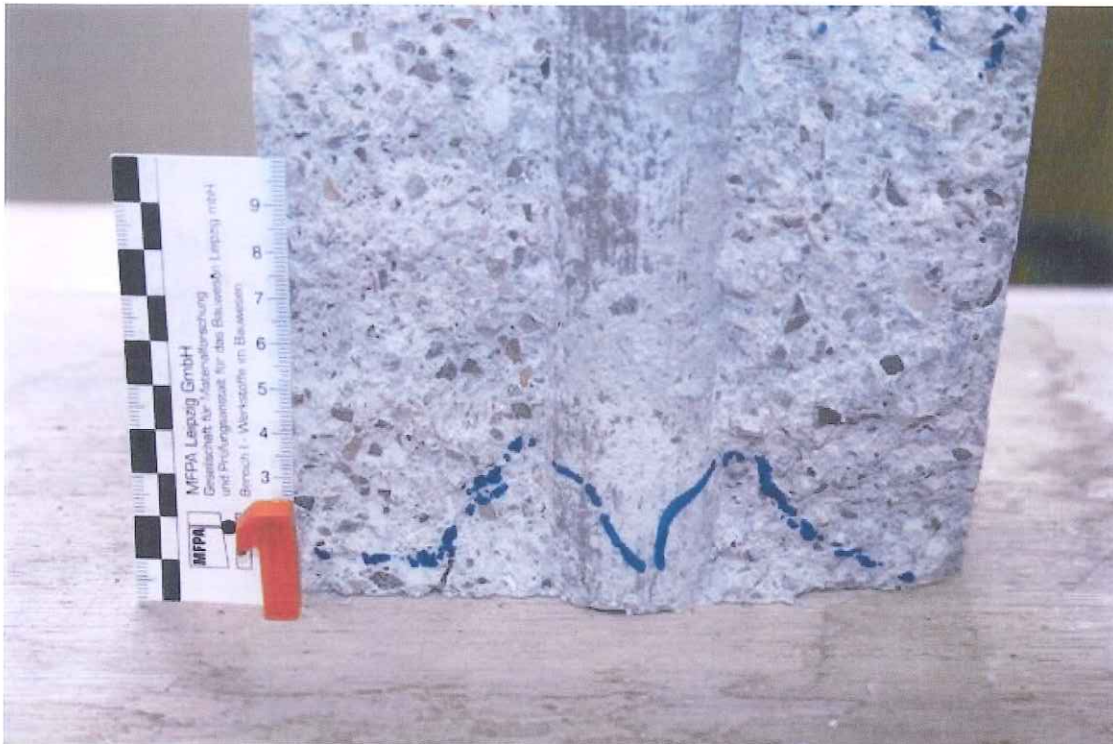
Series A 'FRANK fibre-reinforced concrete distance tubes – MR 22 each sealed with two fibre-reinforced concrete plugs St220020, sample 1
